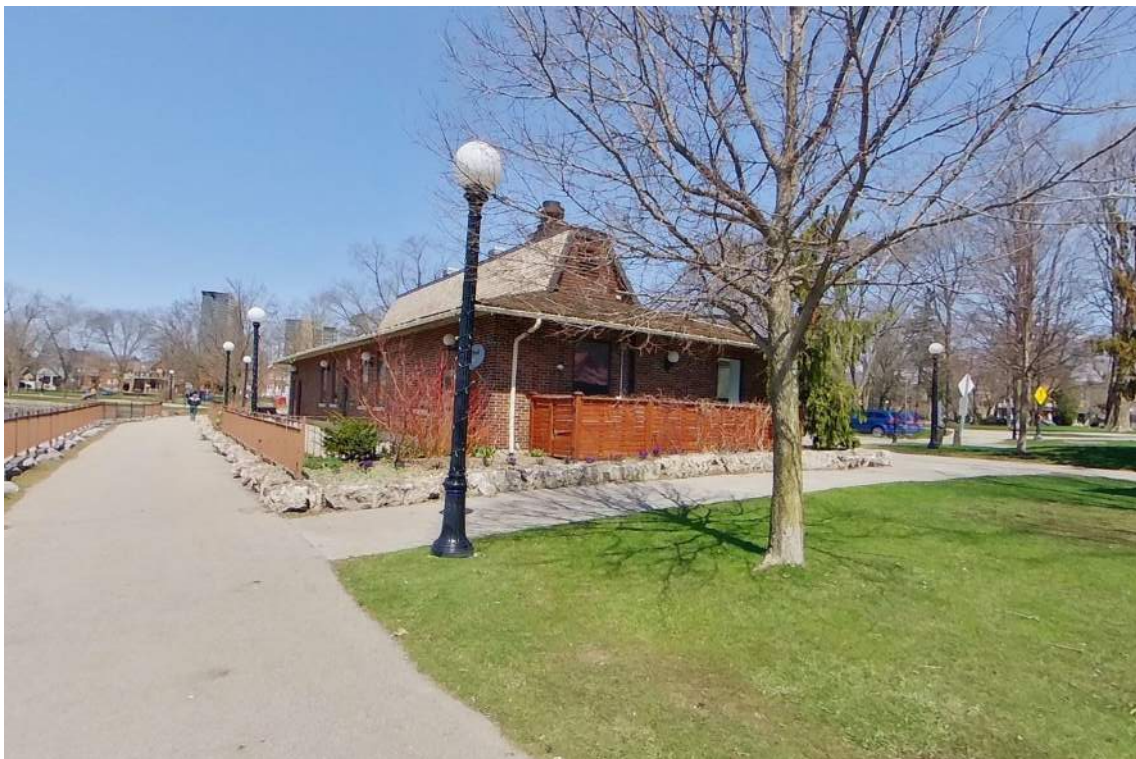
View of the existing building on site from the park walkway along the lake looking northwest
